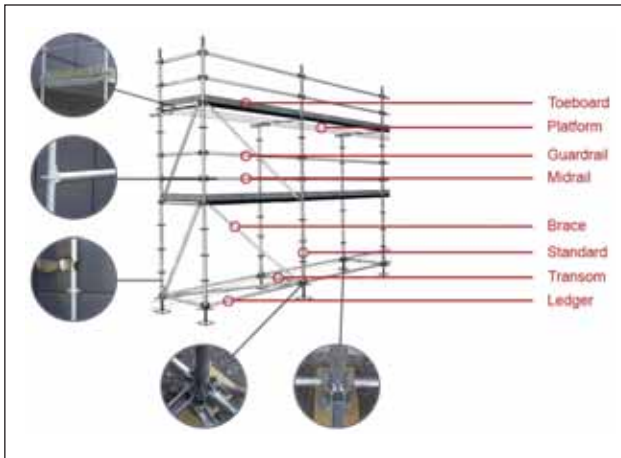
Basic scaffolding structure, adapted from <http://www.roundscaffolding.com.au/image-gallery>
